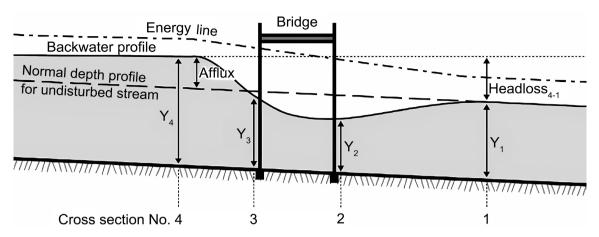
Side elevation at a bridge contraction. Source: Lamb, R., et al., 2022 [7].
